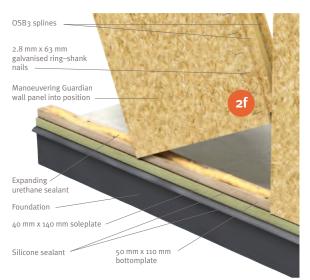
Wall Panel Joints > 300 mm from Joints in Bottomplates
